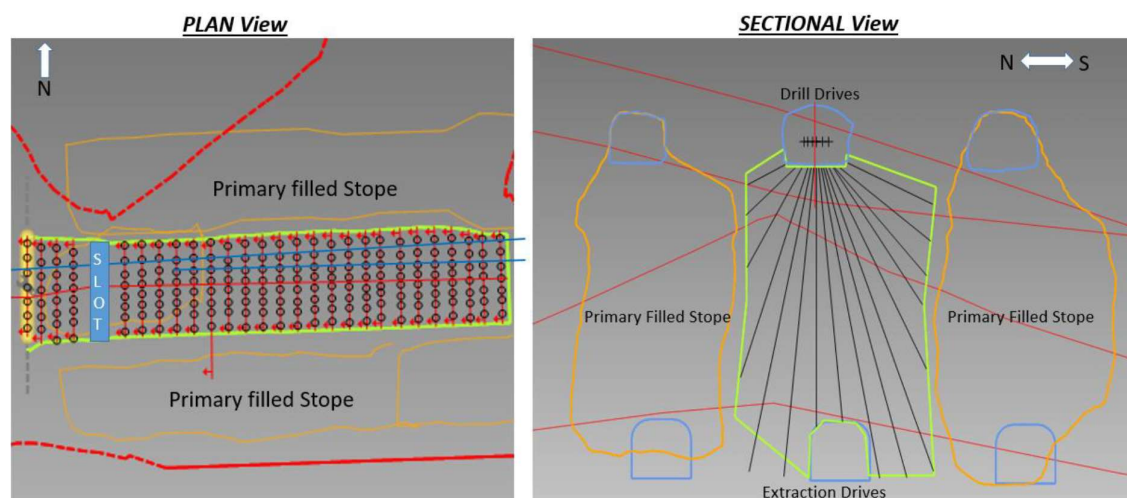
Drill plan (Left) and section (Right) for Longitudinal LHOS
